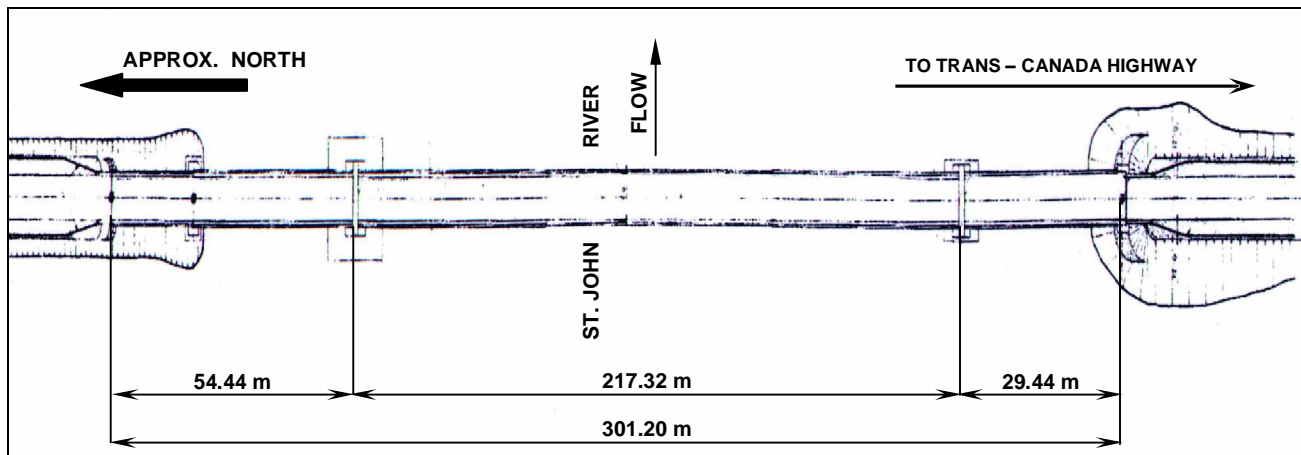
Plan layout of Hawkshaw Cable-stayed Bridge
